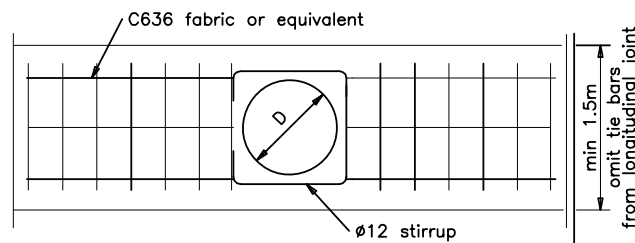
JOINT ADJACENT TO MANHOLE SLAB
